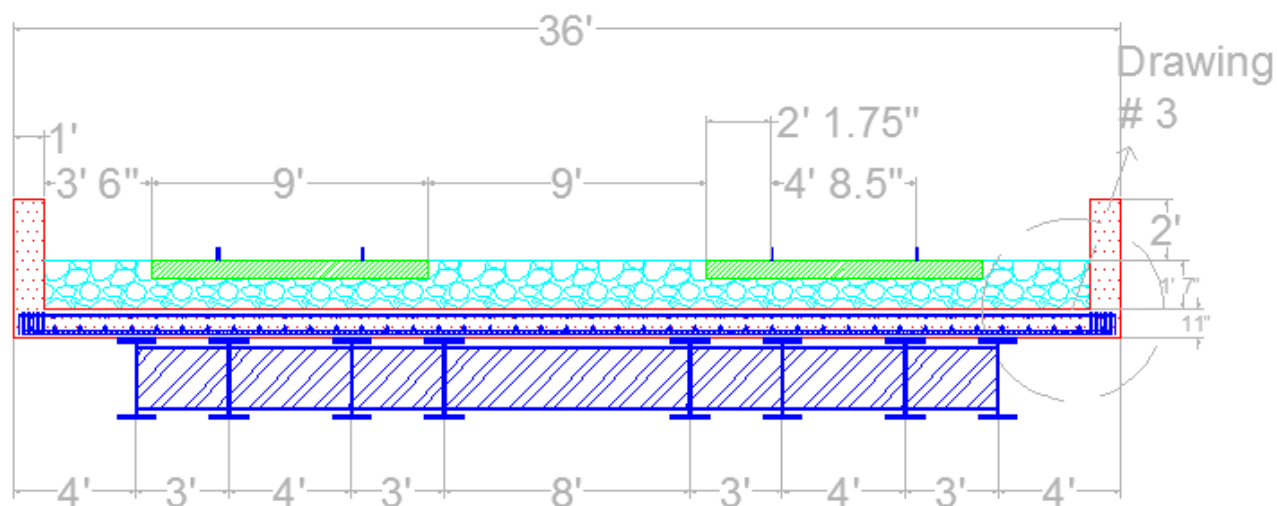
Drawing #2: Section A-A, Lateral View of Superstructure
